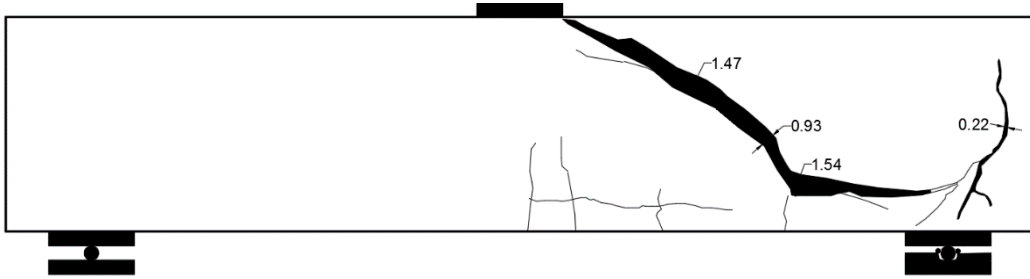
Crack pattern at failure for SNFRC 0.5% beam #5
